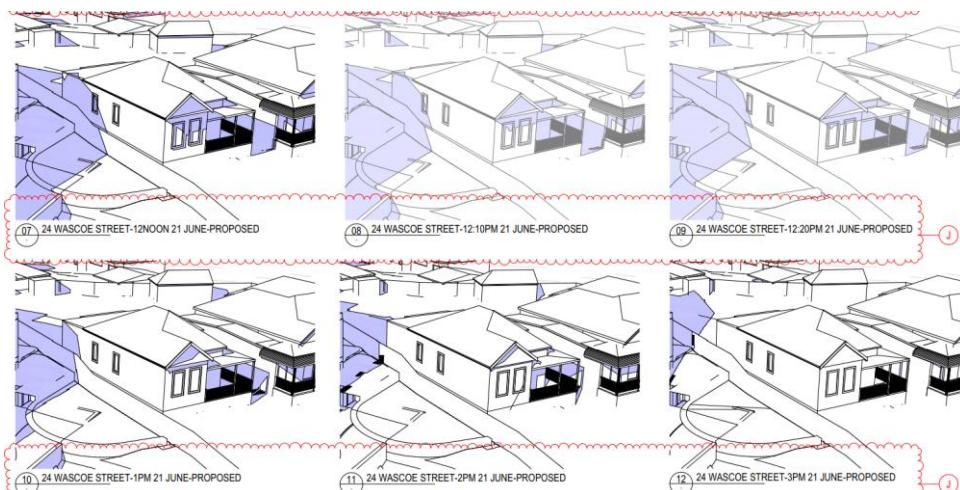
Elevation shadow diagrams (Source: PBD Architects)
